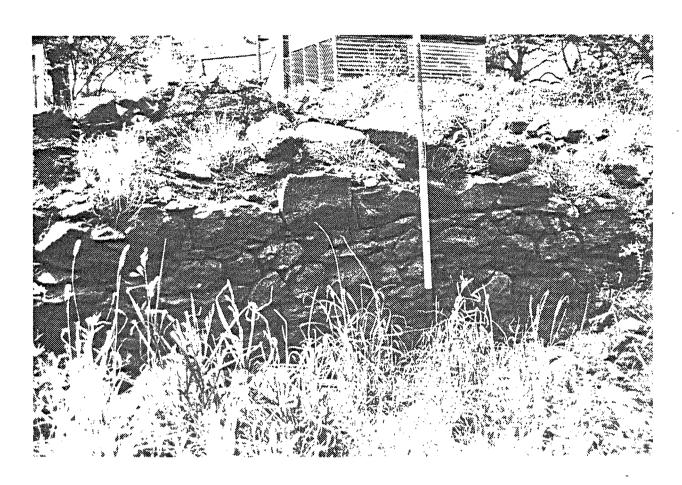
Construction evidence of bluestone wall, used also as part of cottage
